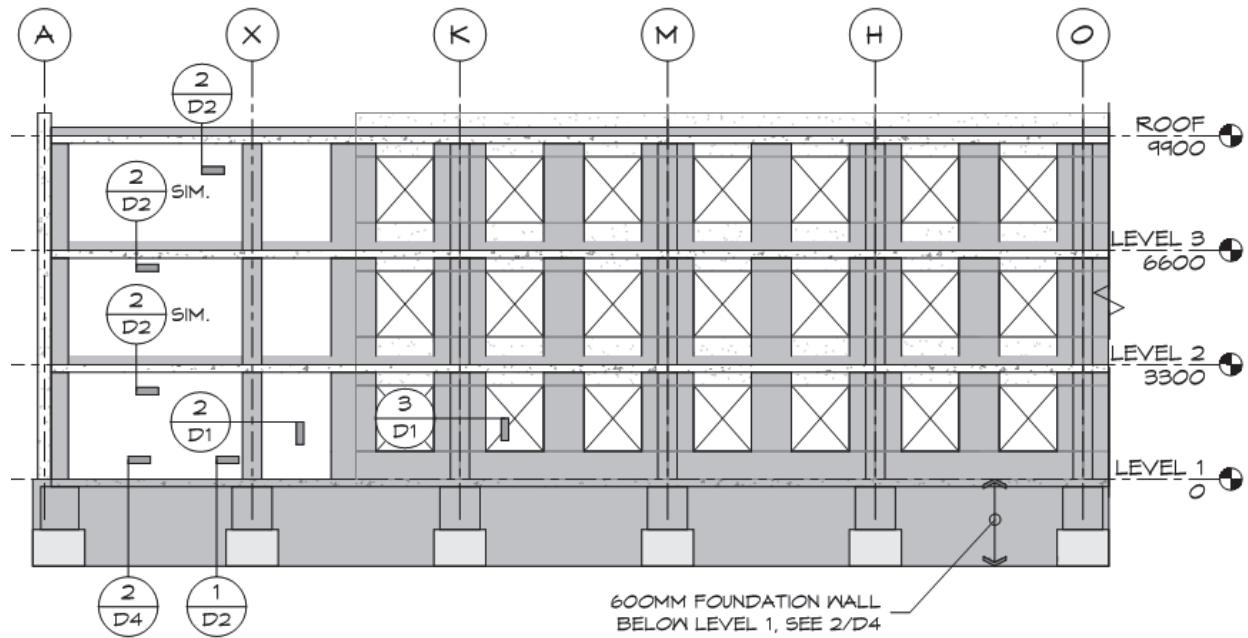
Reinforced concrete fingers covering every precast panel in PC Increment 4.
